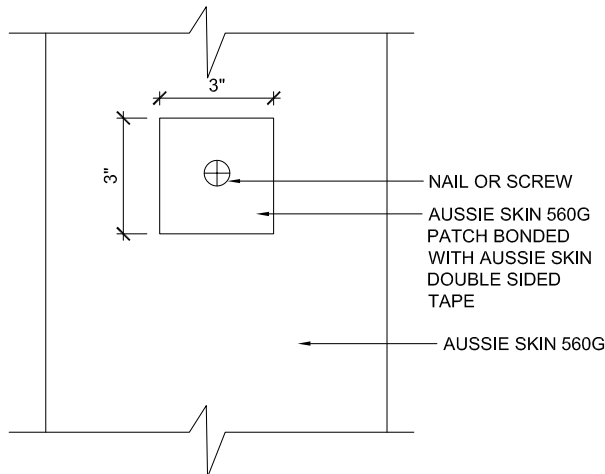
PATCHING AUSSIE SKIN 560G
